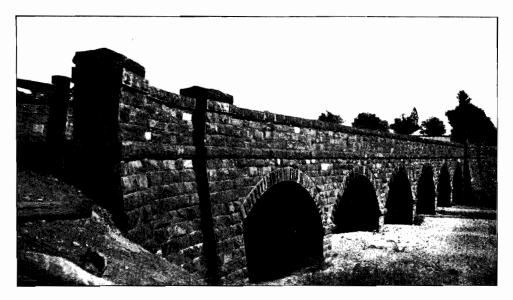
Showing stone bridge at Avenel, on main Sydney-road.
